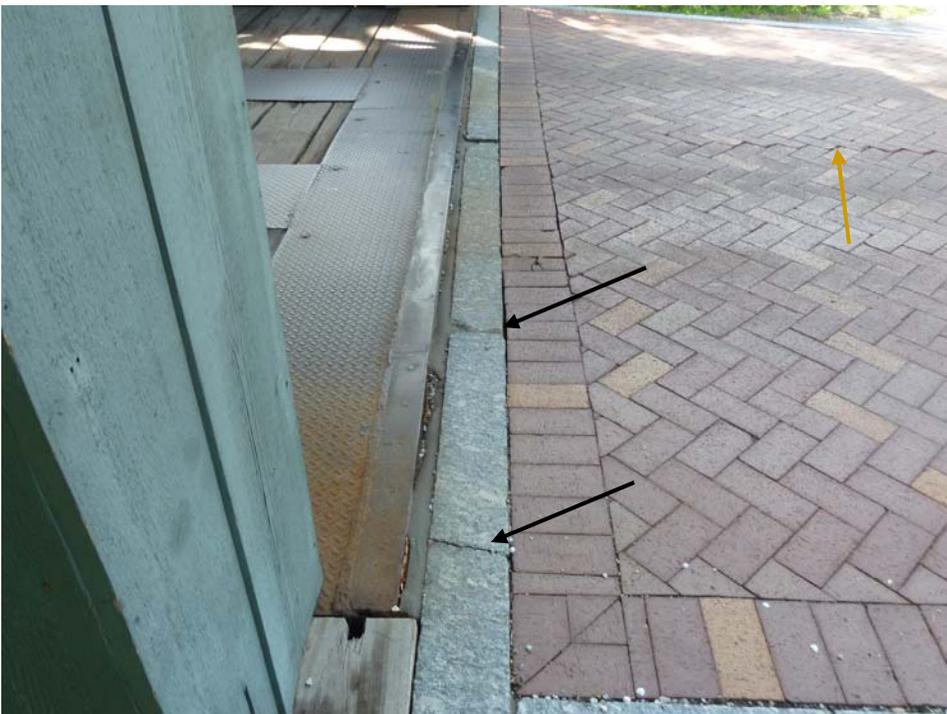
West approach showing cracked granite and deteriorated brick paving. May 2014. (Johnson Lasky Architects)
